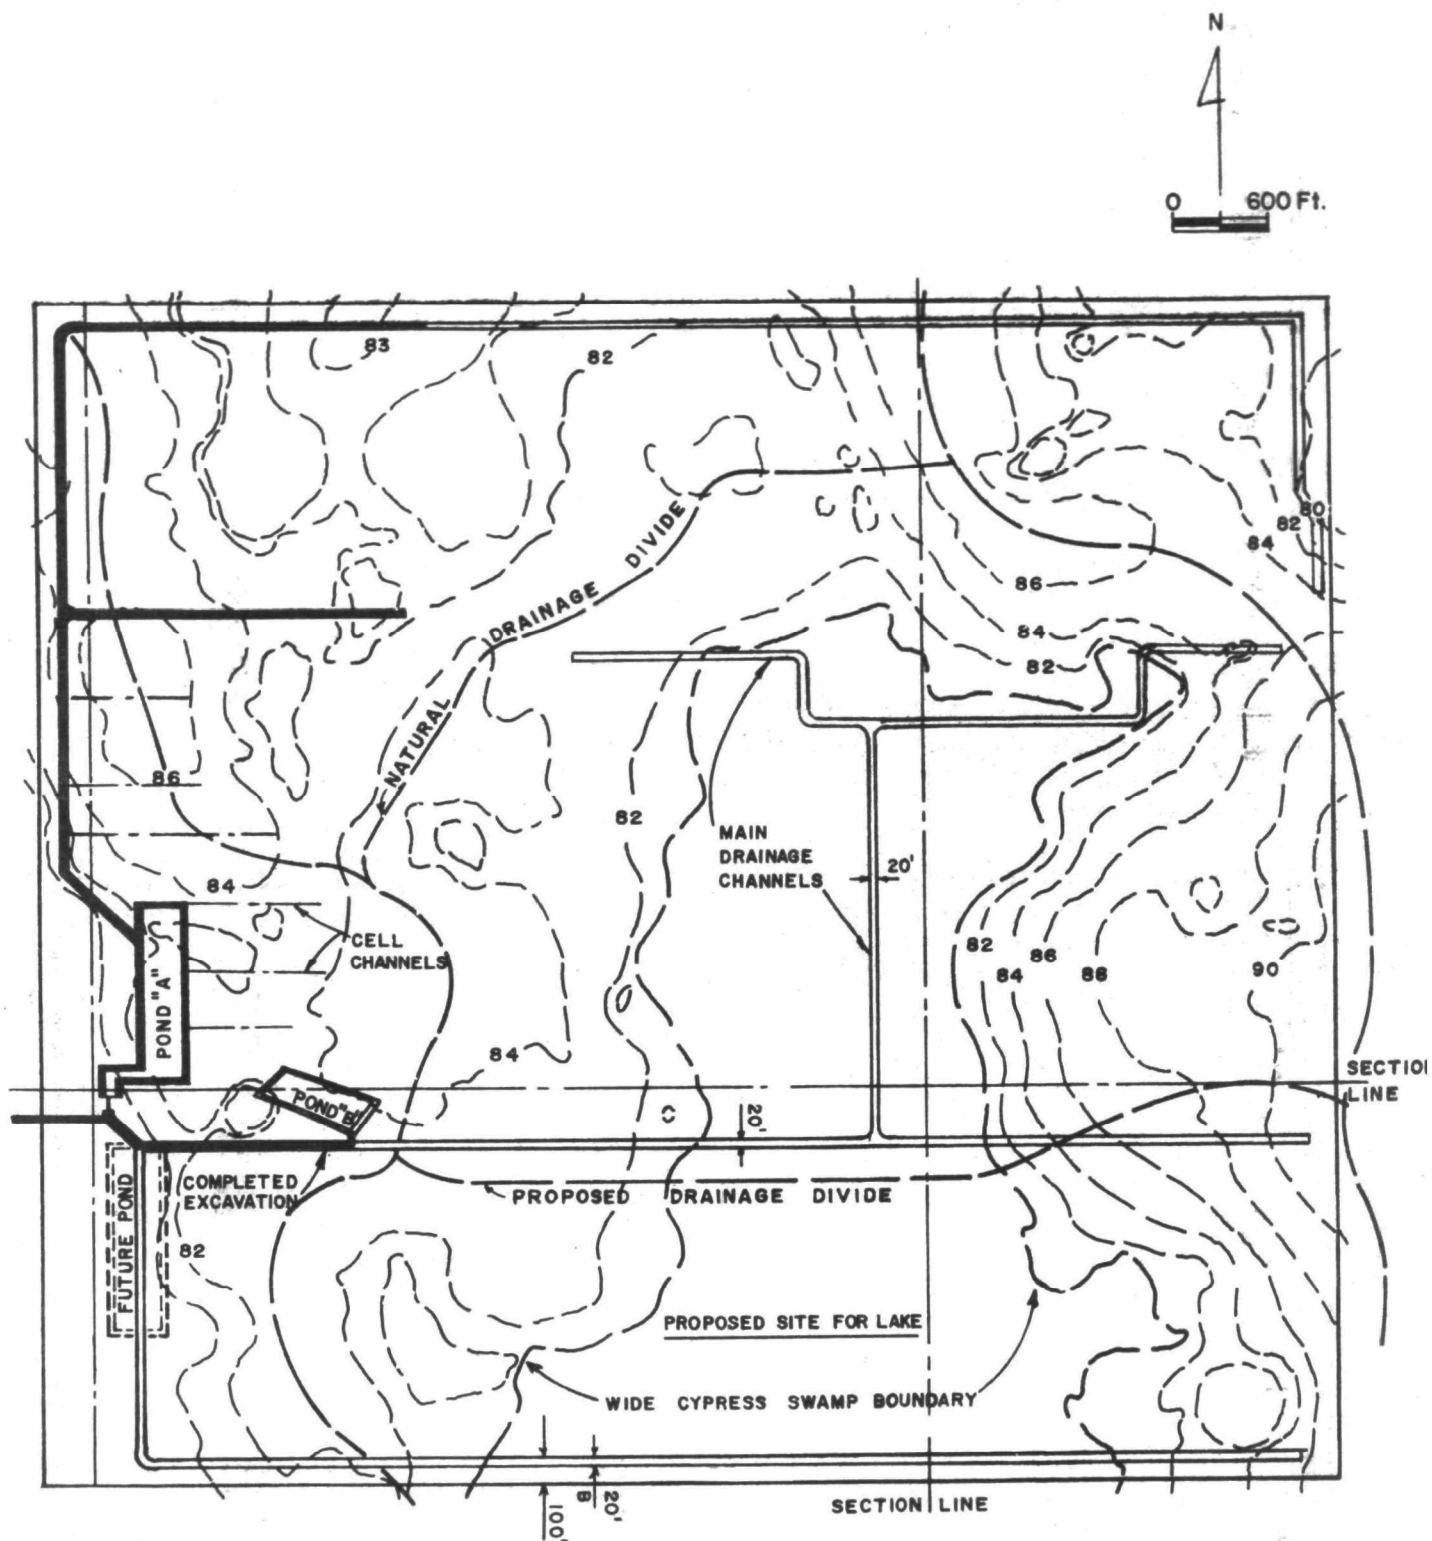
Master Drainage Plan, Orange County Landfill Site.
